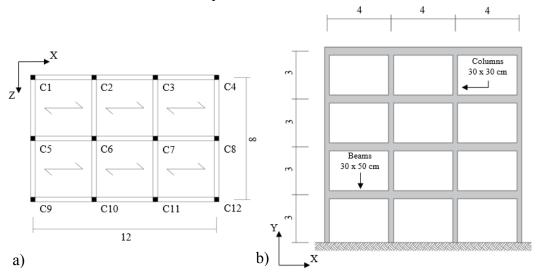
Existing RC building in Potenza: (a) plan view and (b) elevation view [11]
